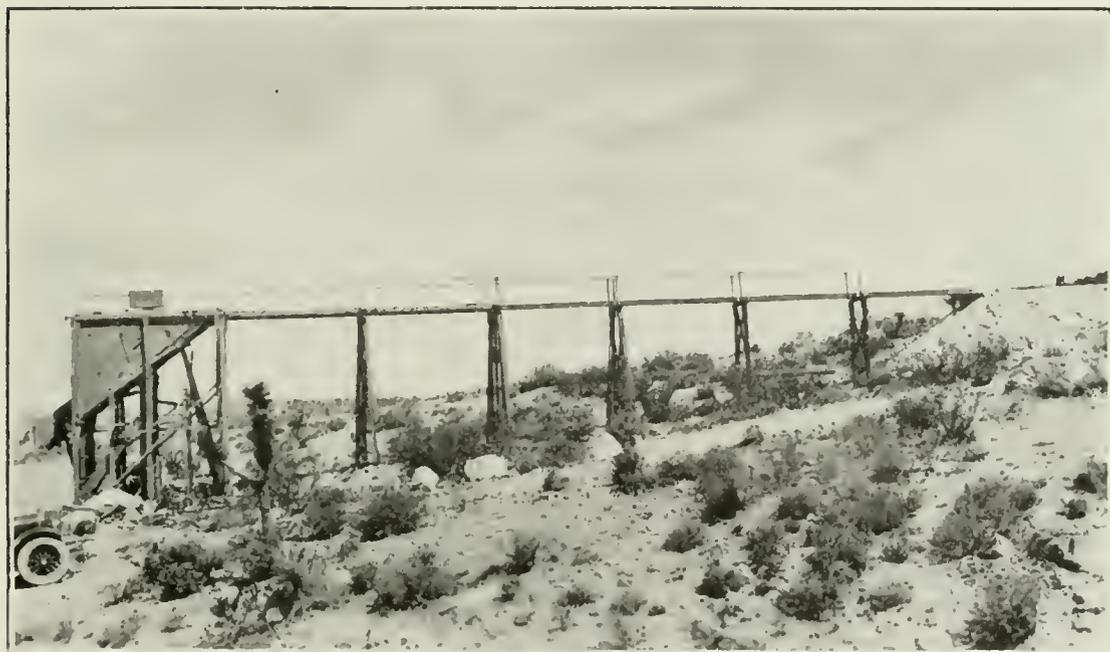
Pacific Kaolin Mine. Standard Sanitary Co. Trestle and bin on lower tunnel level. (Sample No. 44 taken from face of slope.)
